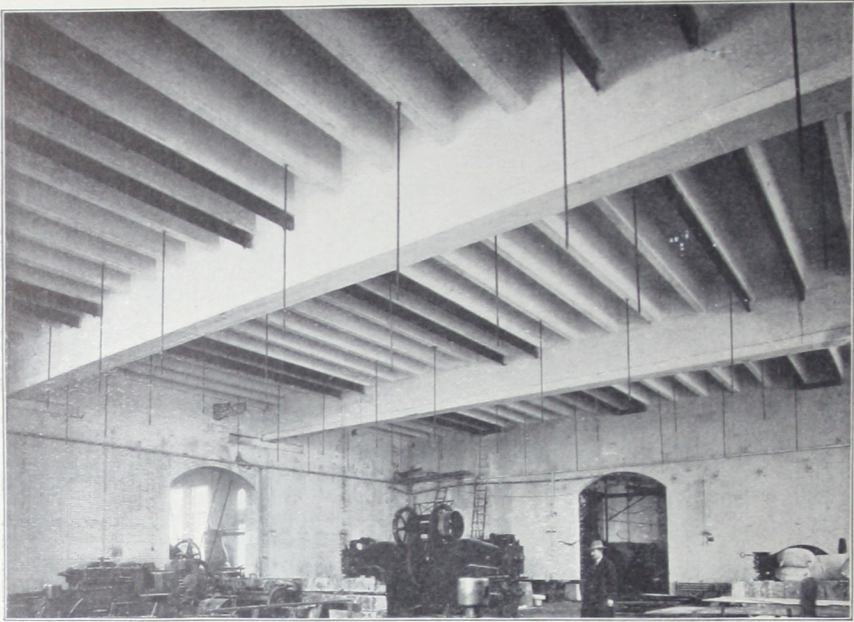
PLATE VI. UNDER SIDE OF FLOOR CONSTRUCTION.
